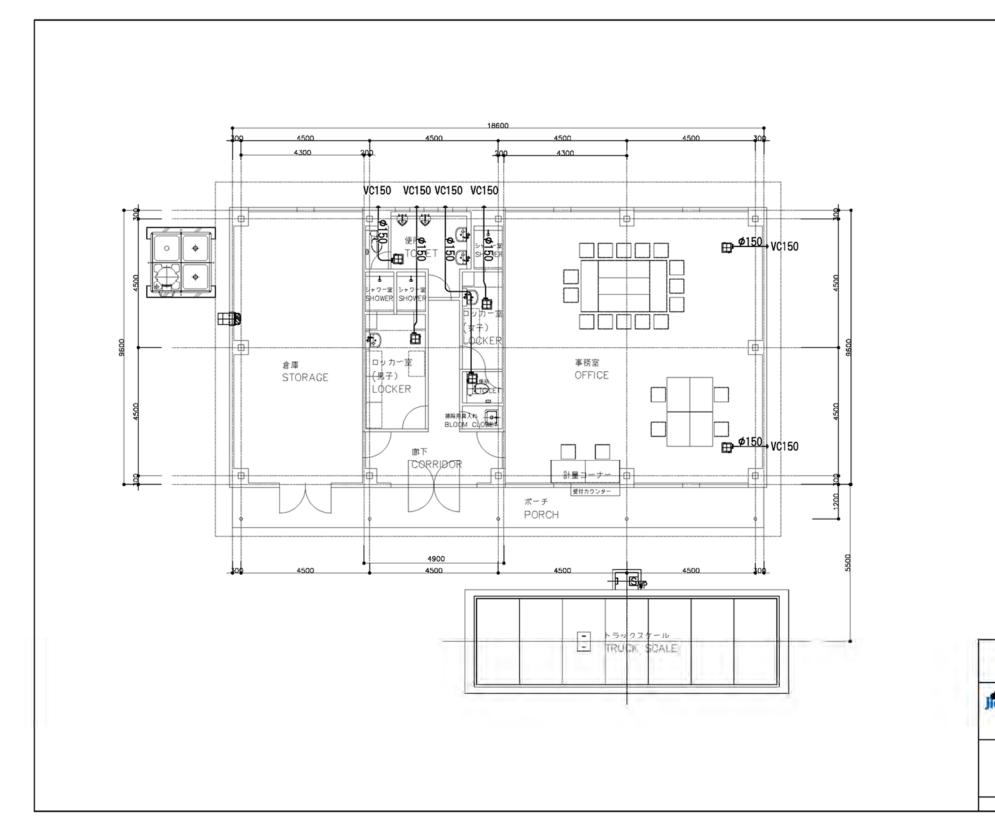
Mechanical Facilities in Administration Building Ventilation Plan
